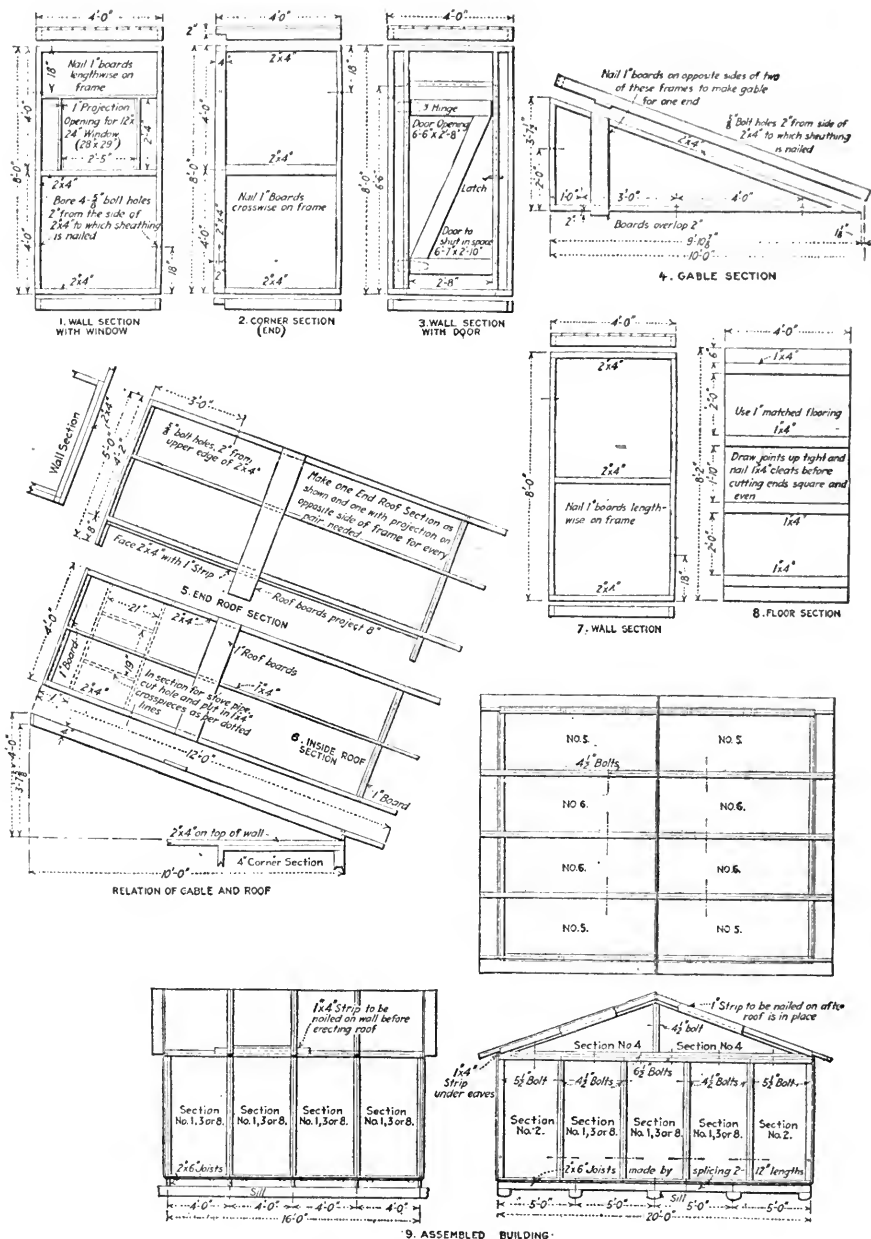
SECTIONAL CAMP BUILDING, PANELS SEPARATE AND ASSEMBLED.
